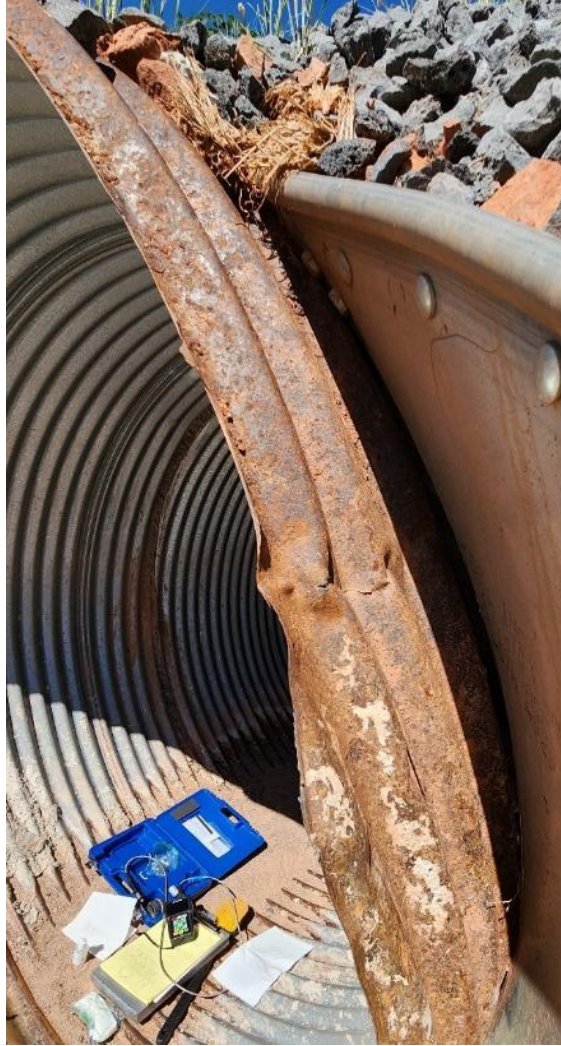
Outside of the outlet showing extent of corrosion on I-25 MP 264.2 culvert.
